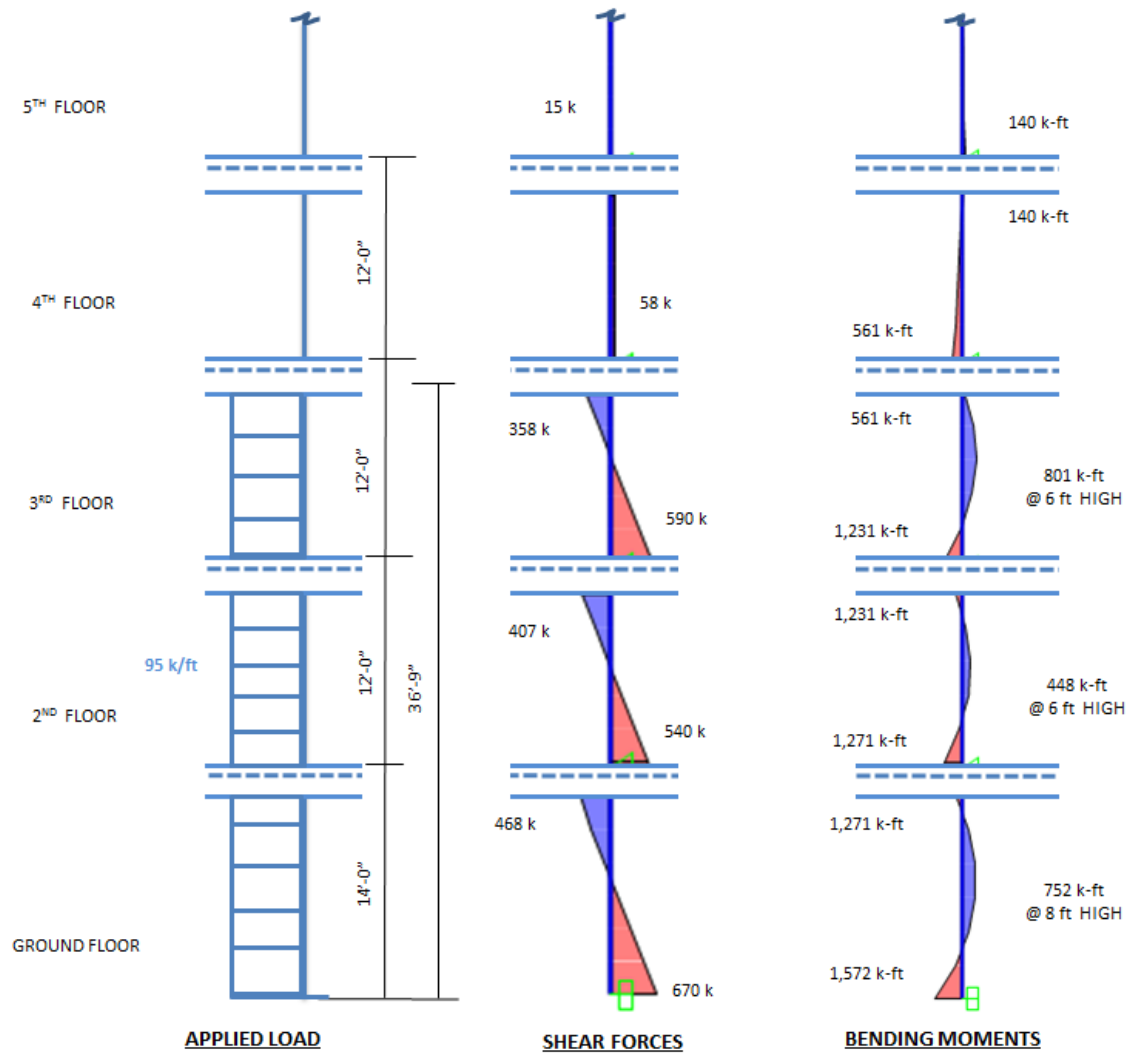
Hydrodynamic loading on exterior column of the Hilo office building due to Load Case 2
